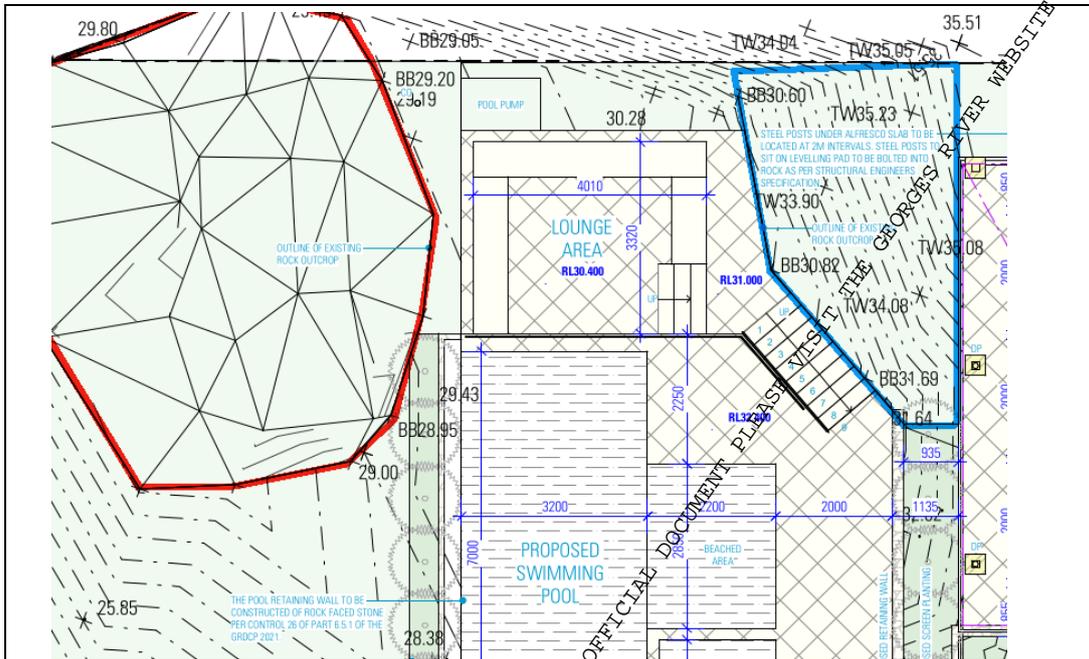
Main natural features on site: large boulder (in red) and exposed sandstone rock wall (in blue) (Source: Architectural Plans)
